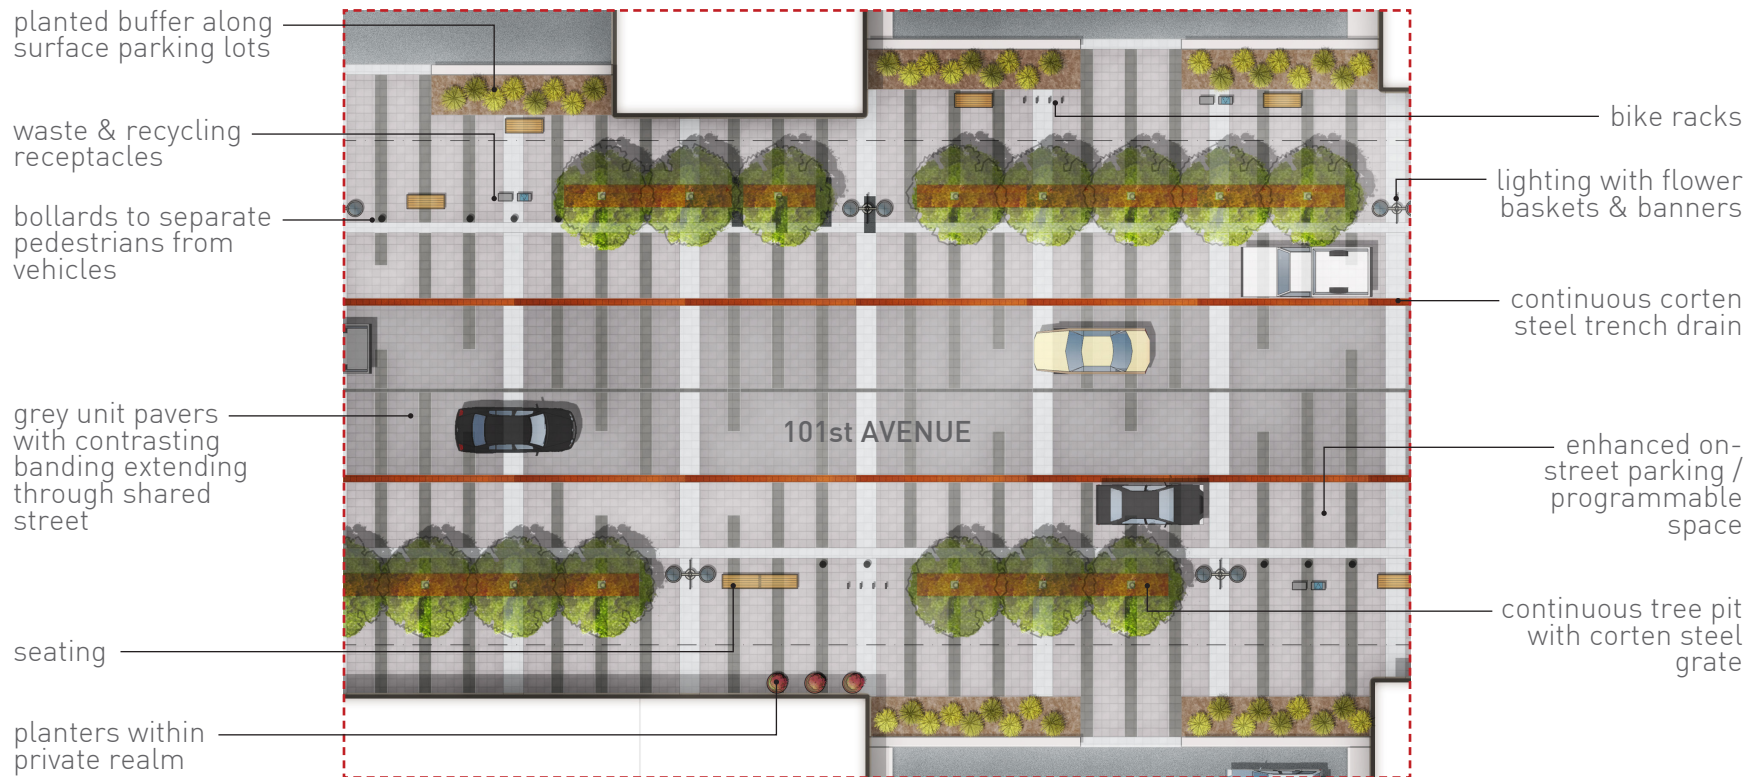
Shared Avenue (101st Avenue) Typical Streetscape Condition Demonstration Plan
